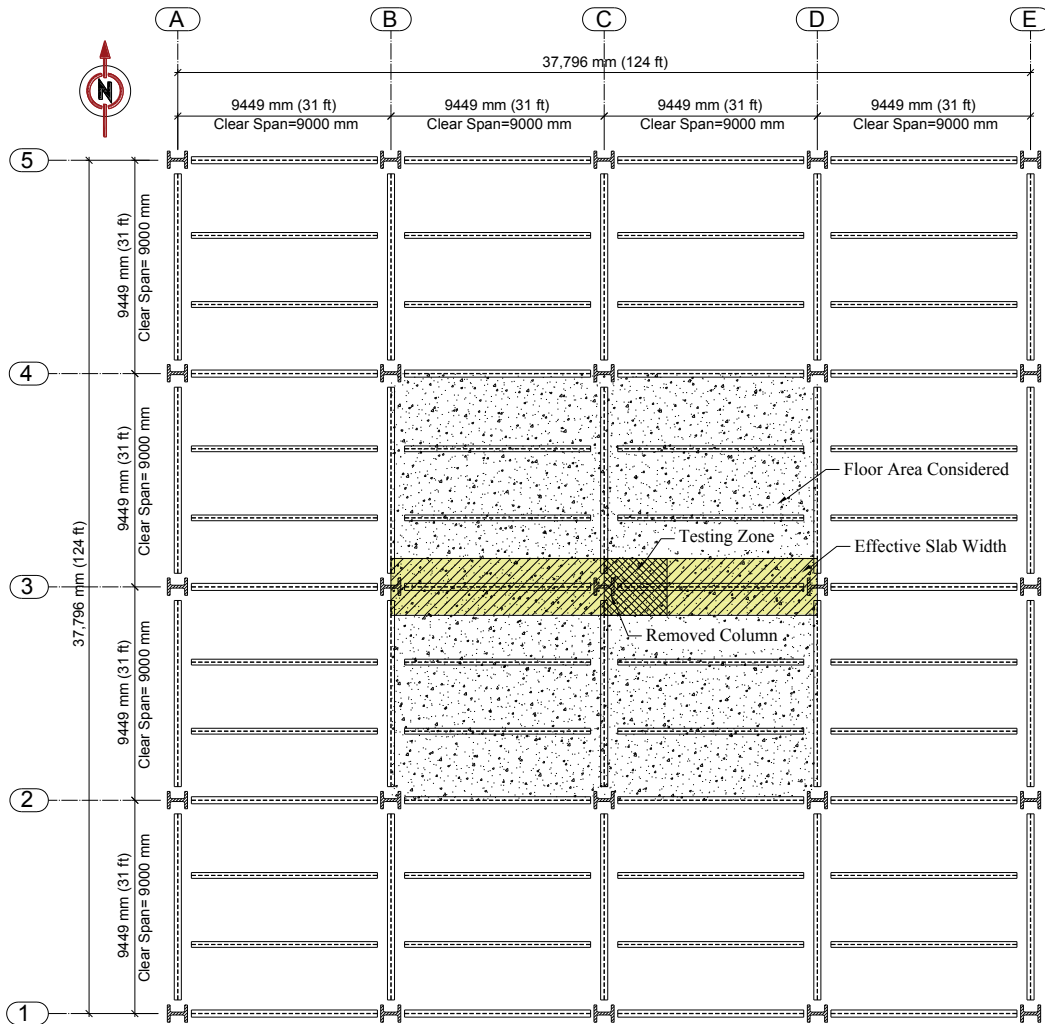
Plan Layout of 4x4 Bay Frame Building with Clear Span of 9.0 m
